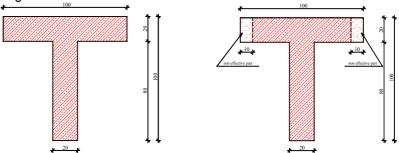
T-Beam section Fig. 3-2 T-Beam section with non-effective part
